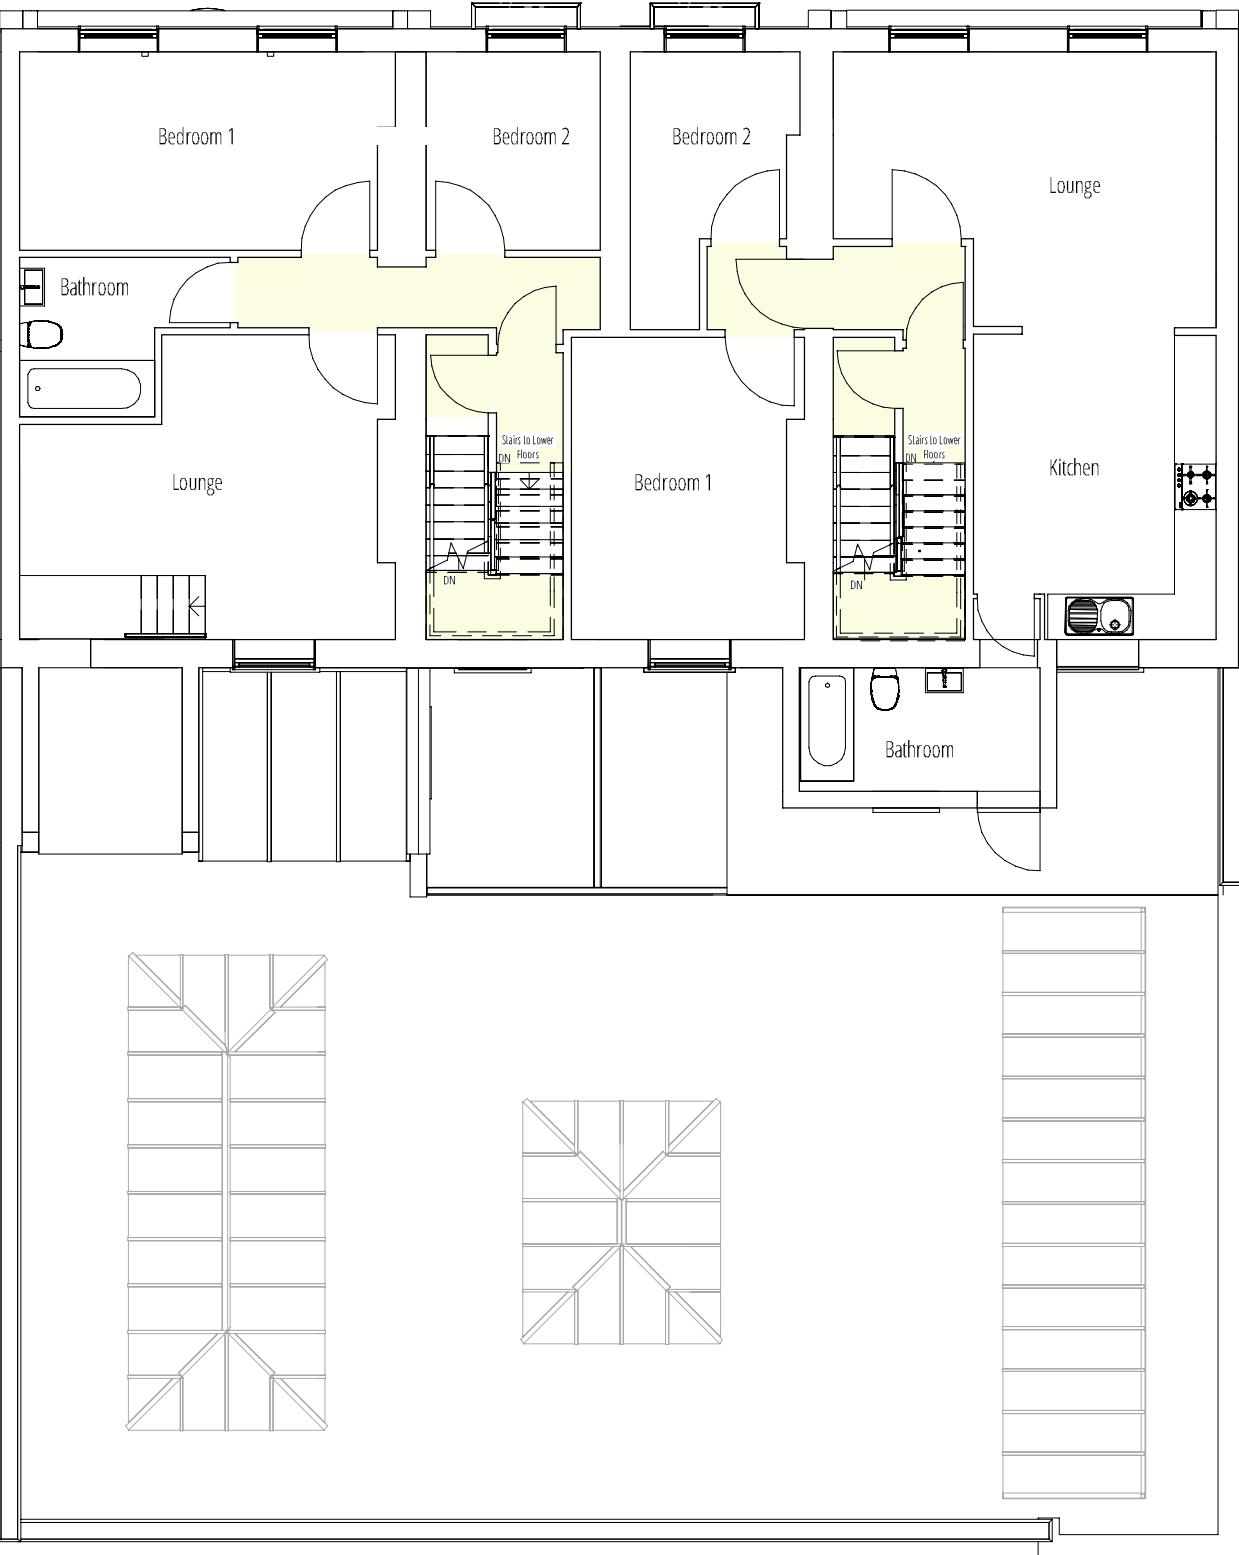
Existing First Floor Plan Scale 1:100 @A3
